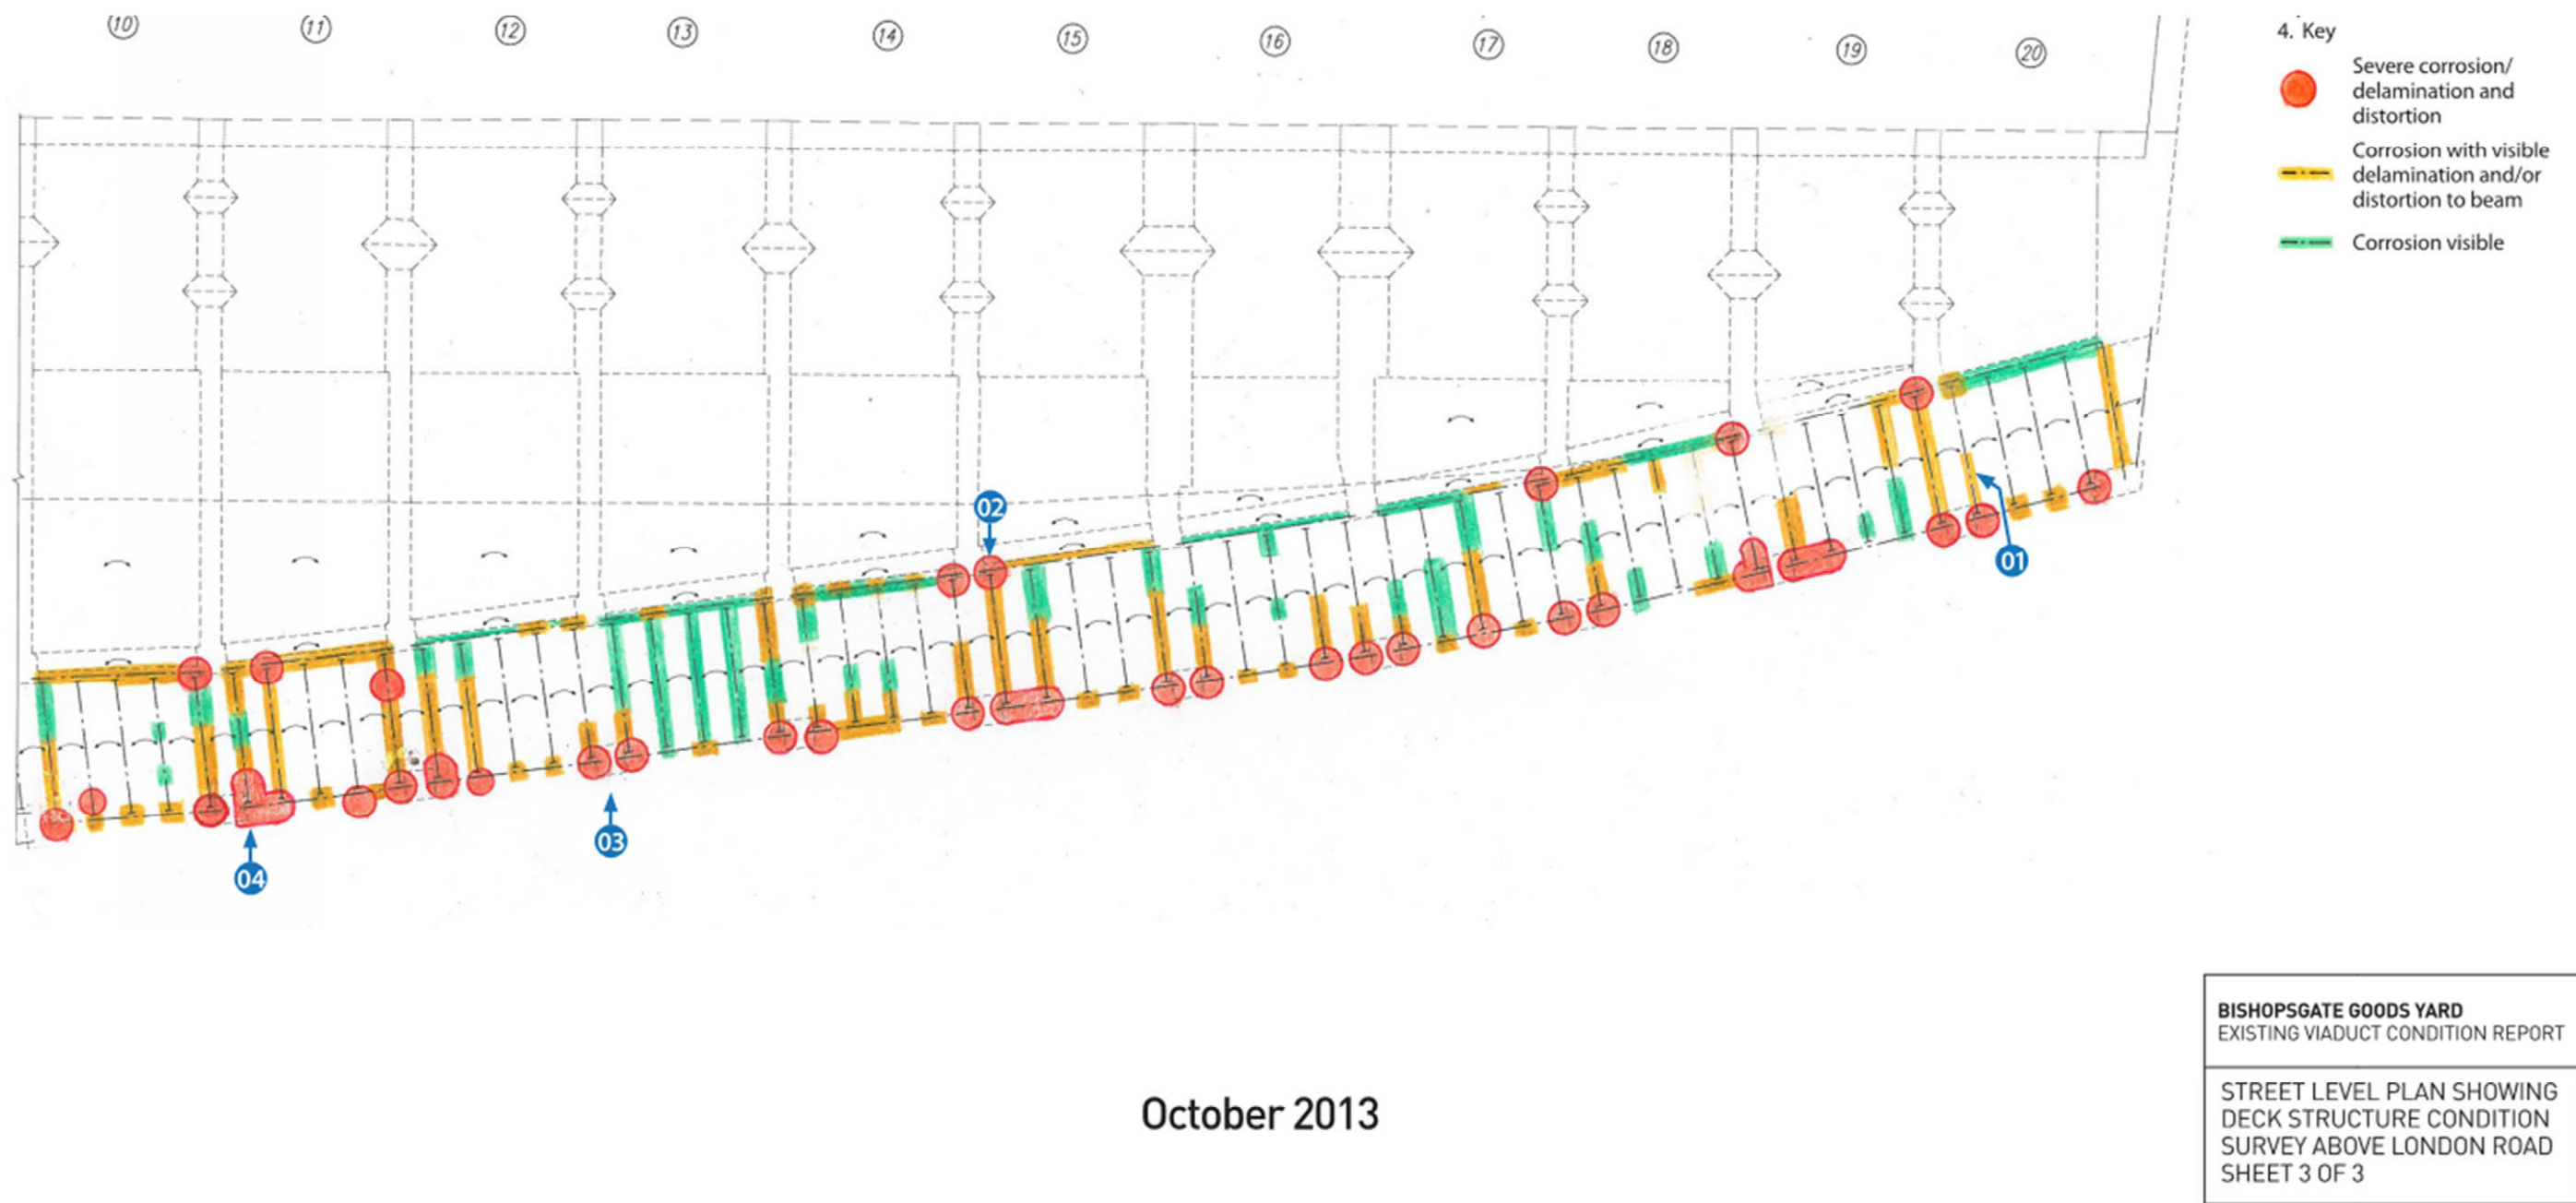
Extract Alan Baxter 2013 report. Condition Plan London Road Deck Structure sheet 3 of 3
